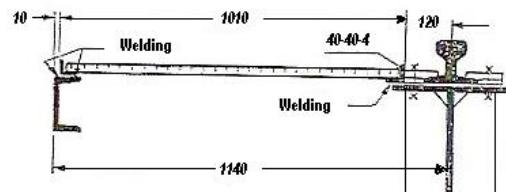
Examples of a runway beams braced horizontally by a plate
